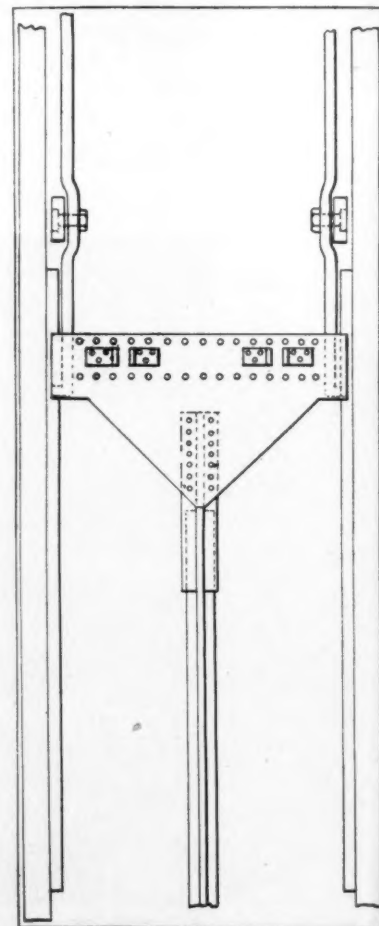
Side elevation showing construction of crosshead and curved arm that connects with floor plate—also wheels that follow the guides.
